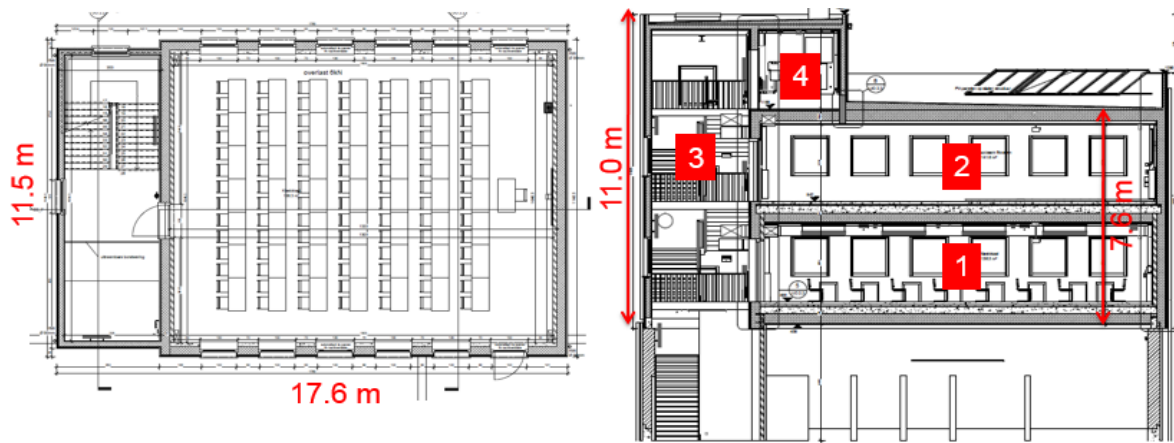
Plan and cross-section of the test classrooms: (1) classroom 1st floor (2) classroom 2nd floor (3) staircase (4) Technical room with AHU
